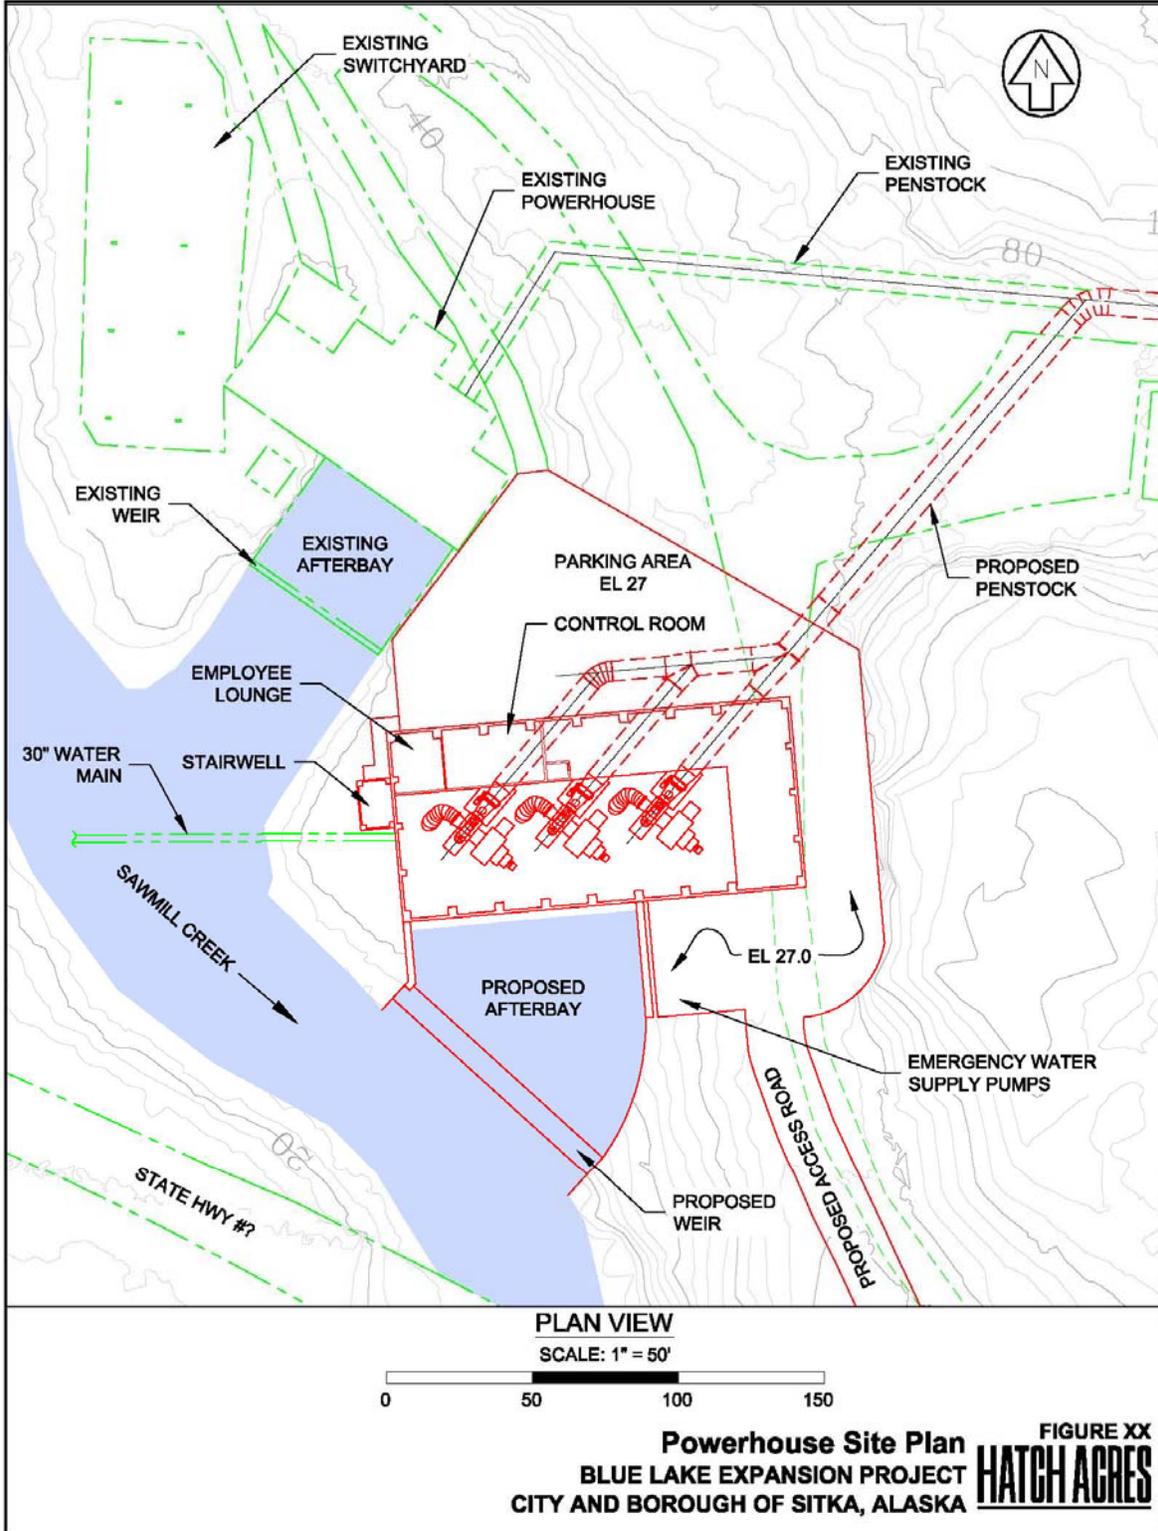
Detail of Powerhouse and Afterbay Arrangement.
